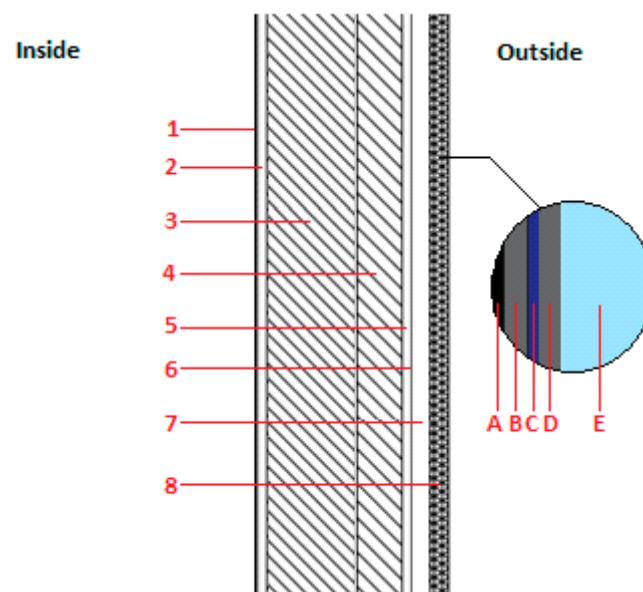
A fragment of the cross-section of the external wall of a building with a PV installation (layers 1–8 described in text).
